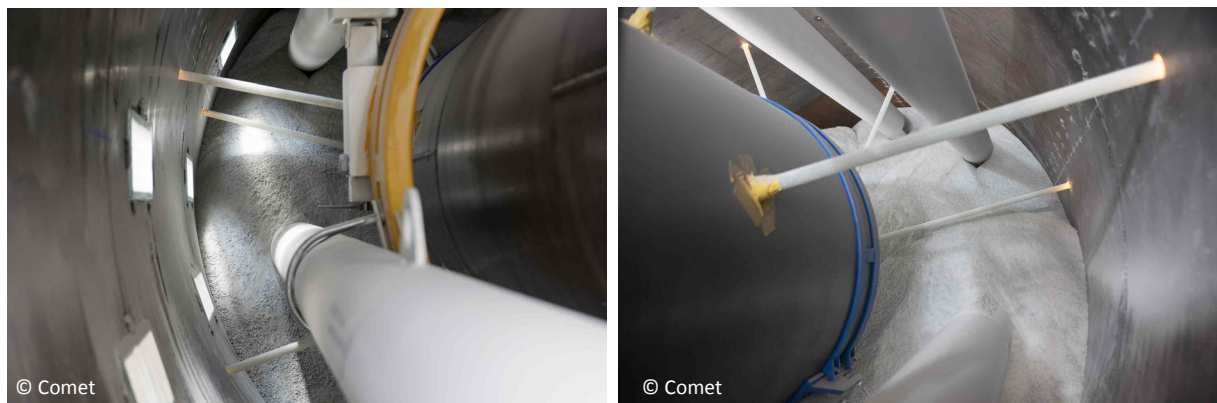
Photo impressions of the backfill slope from the first backfilling mock-up test approaching PR2 access tubes (May 2014).
